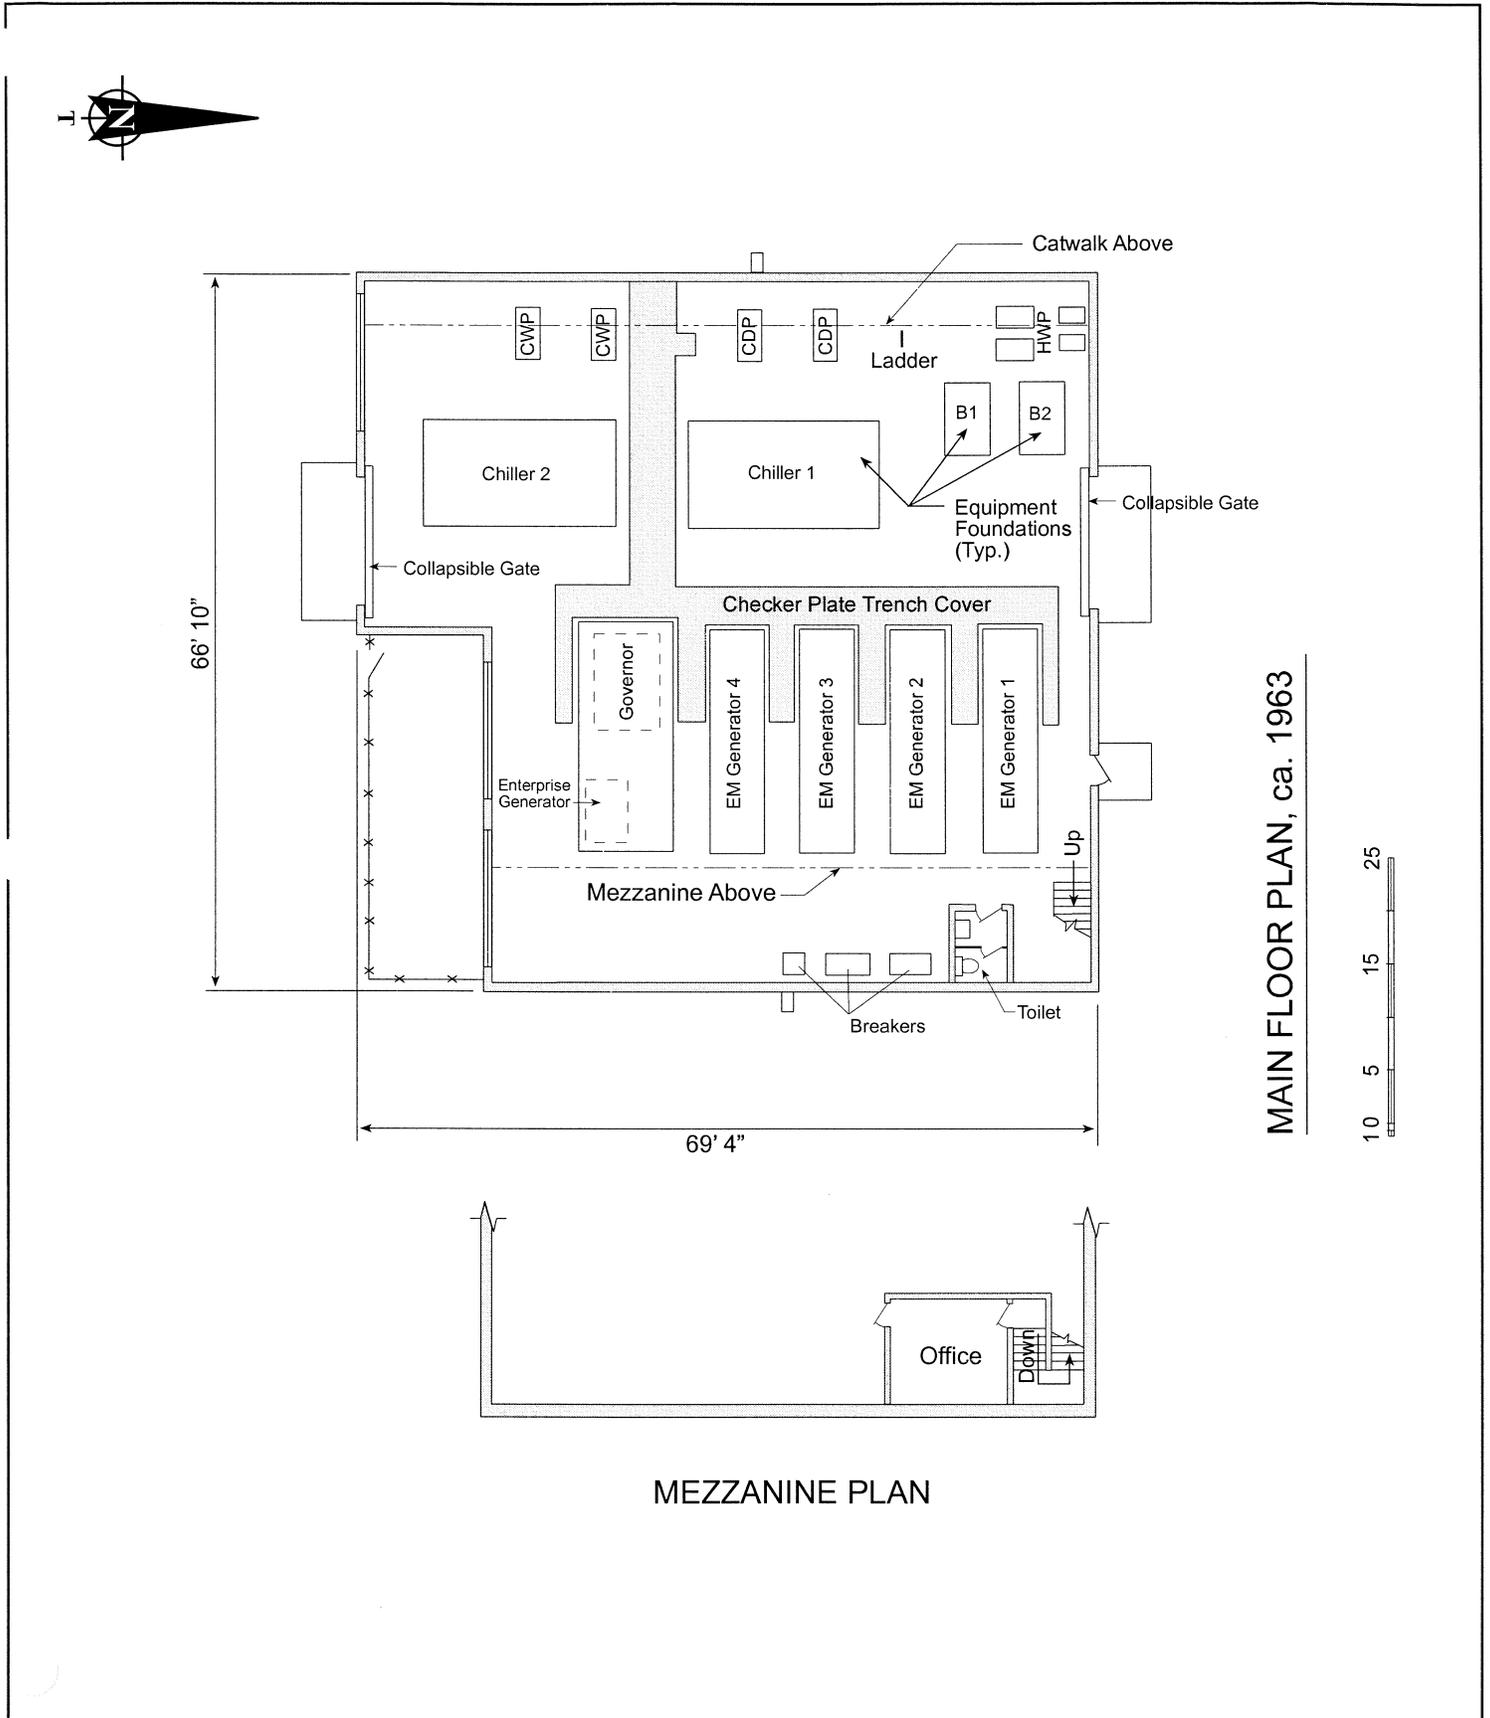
Building 2606, Floor Plan with Equipment Layout, circa 1963
